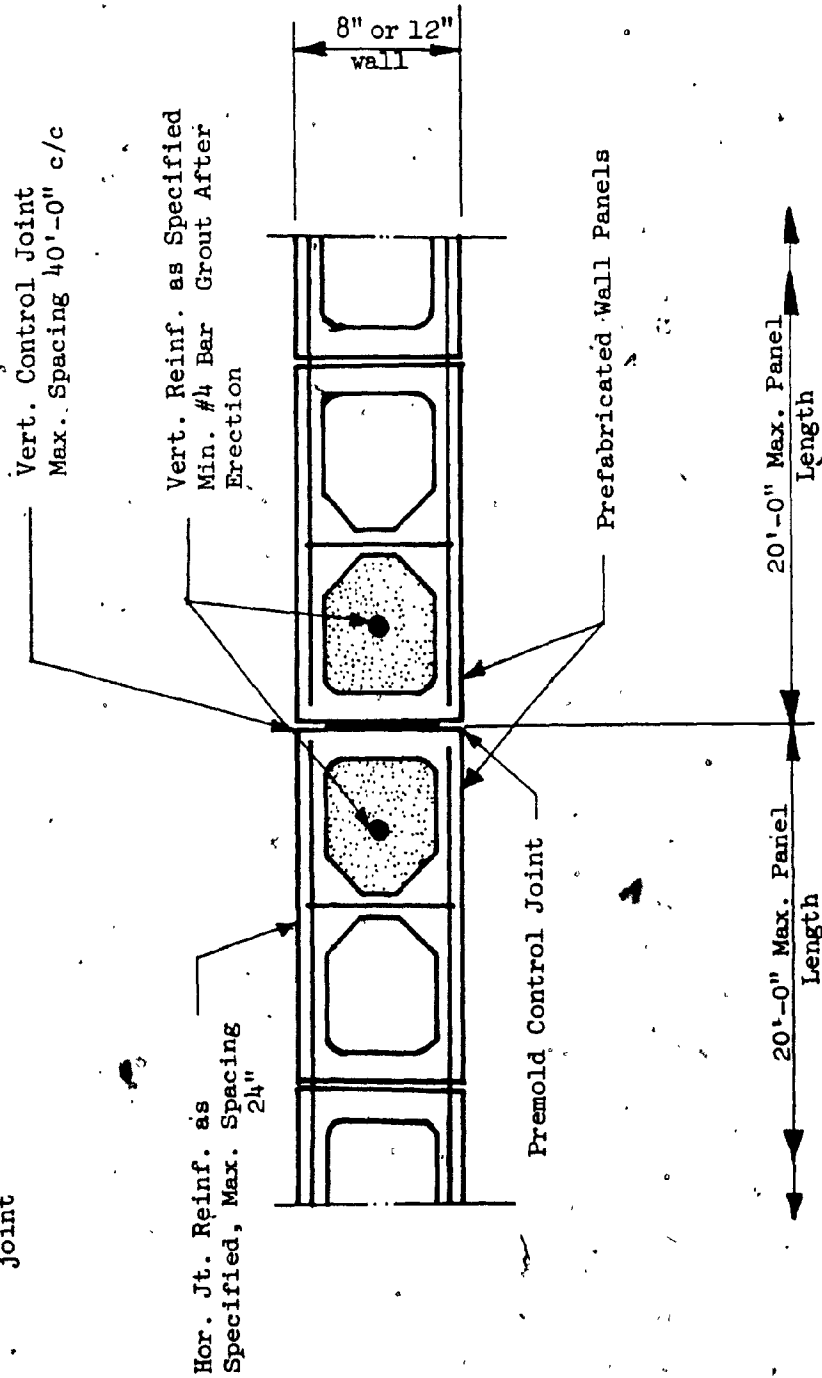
Plan of Typical Masonry Control Joint.
